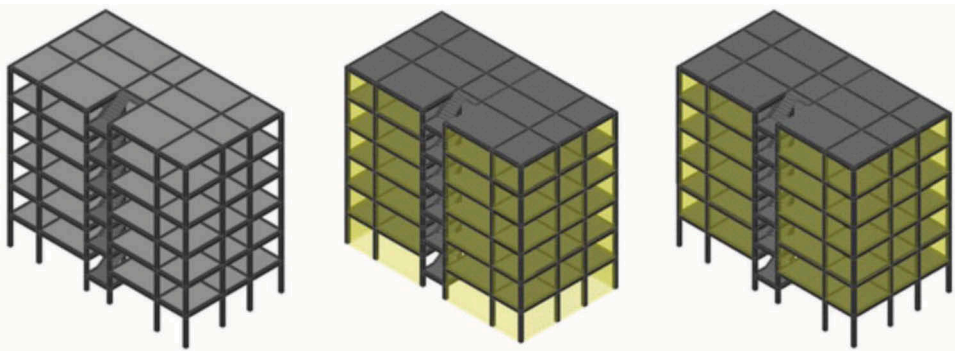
Example of six-story RC building structures: bare frame (left), infilled frame (center); pilotis frame (right).
